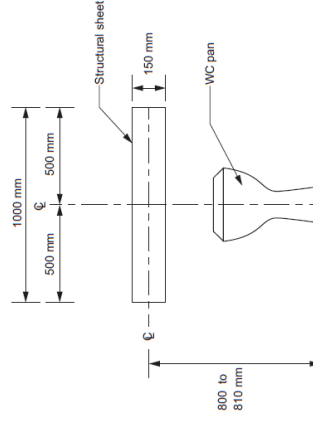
Location of sheeting for a wall behind a toilet pan
